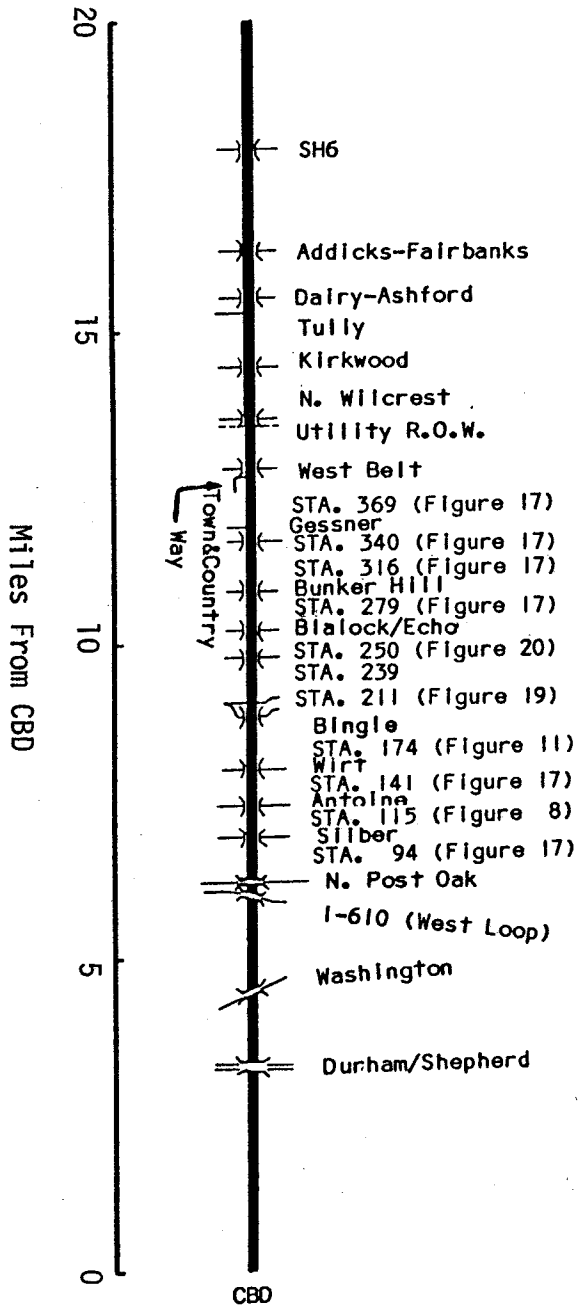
Roadway Stations at Which Cross Sections (Both Existing and Possible Future) Are Presented
